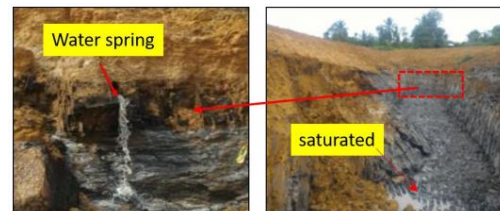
Hard dark grey silty clay shale at the culvert foundation exposed during the excavation. Note the seepage coming from the upstream side of the culvert.
